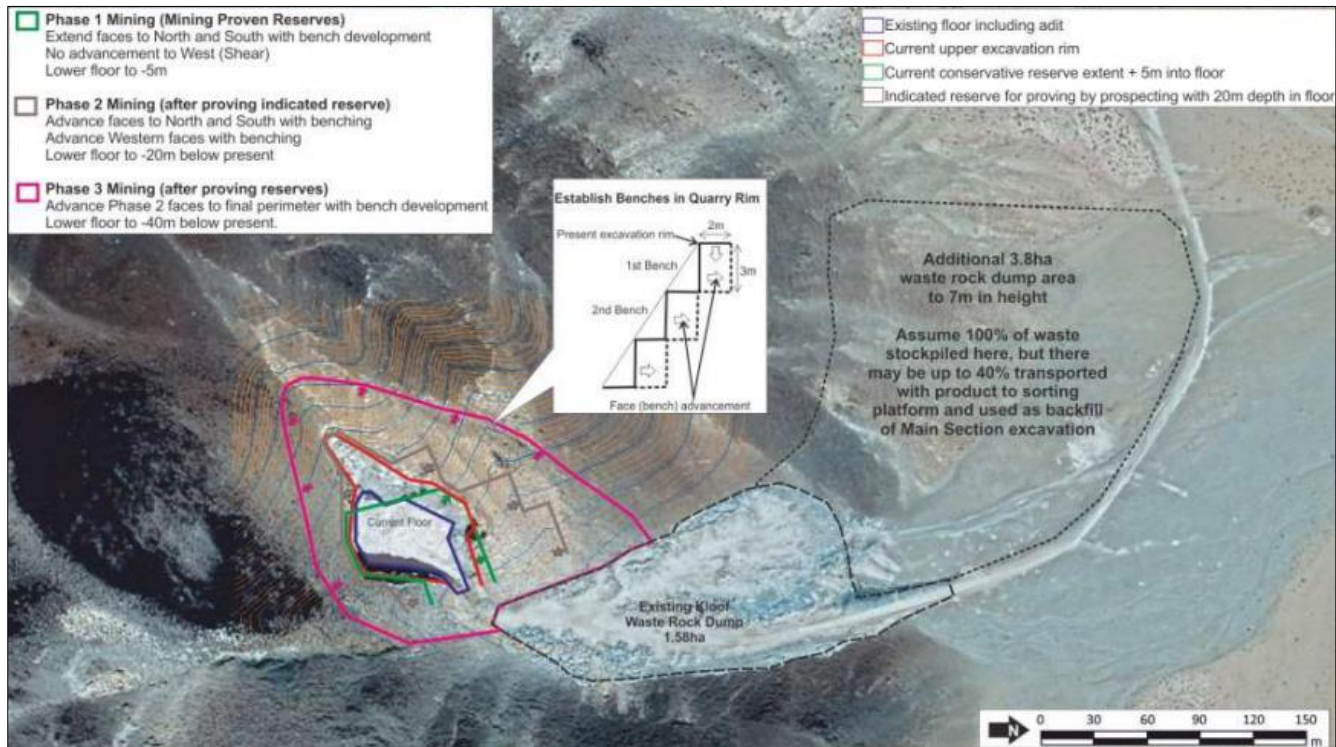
30 year mine plan (Site Plan Scoping Report 2021.11.22)
